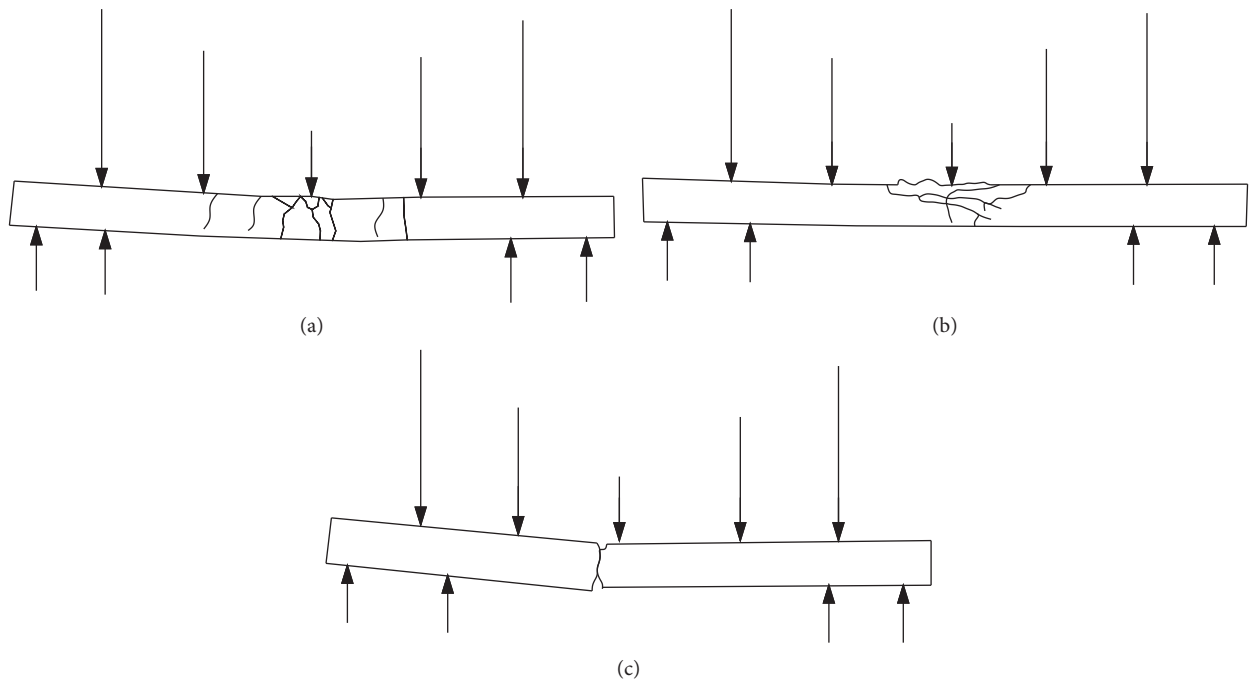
The failure form of normal section of thin immediate roof under uniform load. (a) The under-reinforced beam failure. (b) The over-reinforced beam failure. (c) The low-reinforced beam failure.
